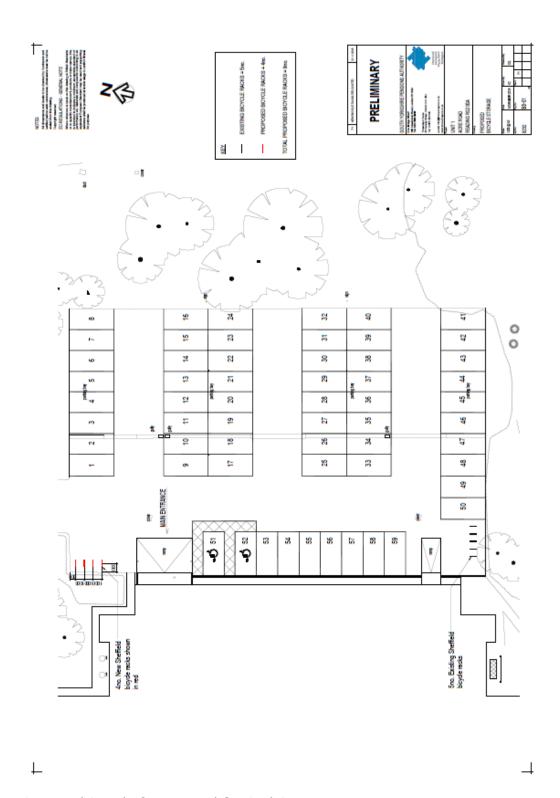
Rev. B - Proposed Ground Floor Plan (received 18/06/18)
